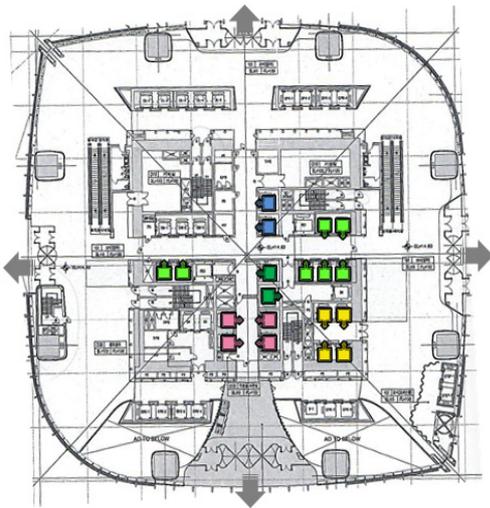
Layout of 19 escape elevators on 1st floor plan of the Lotte world tower.
